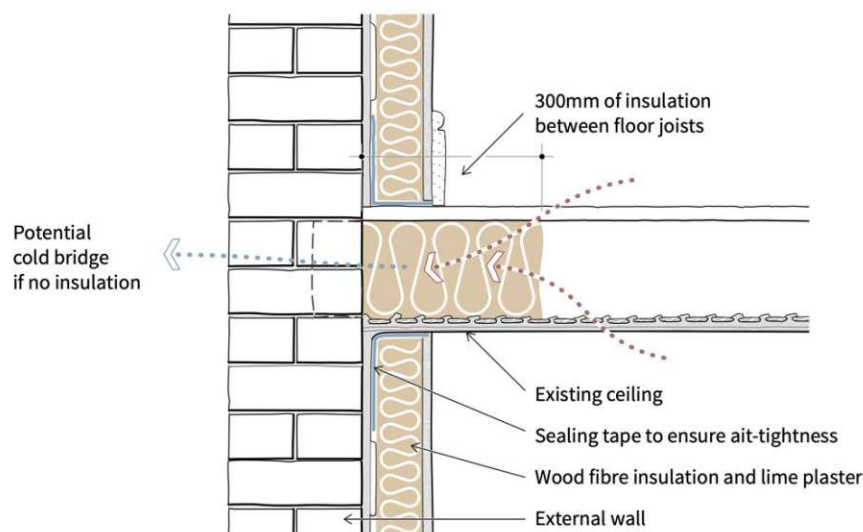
Insulation of external walls and floor (Historic England, 2016 b, p.14)
